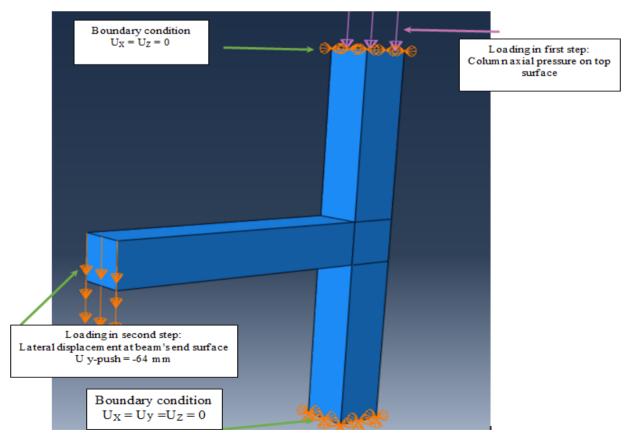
Simulated boundary conditions and loading of the specimen for exterior beam - column joint.
